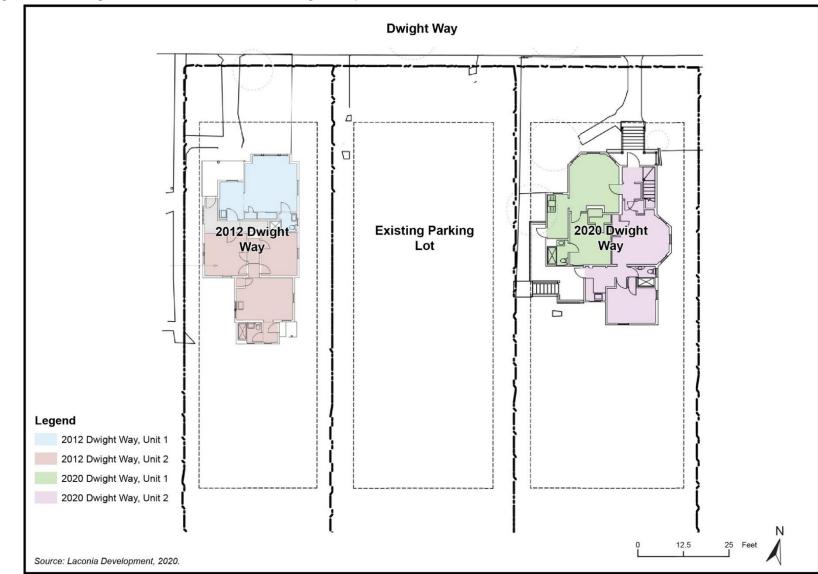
Existing Site Plan – 2012 and 2020 Dwight Way
